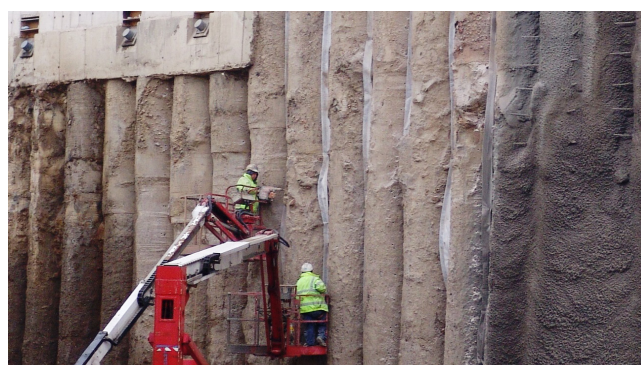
Piledrain nailed into position between contiguous bored concrete piles.
